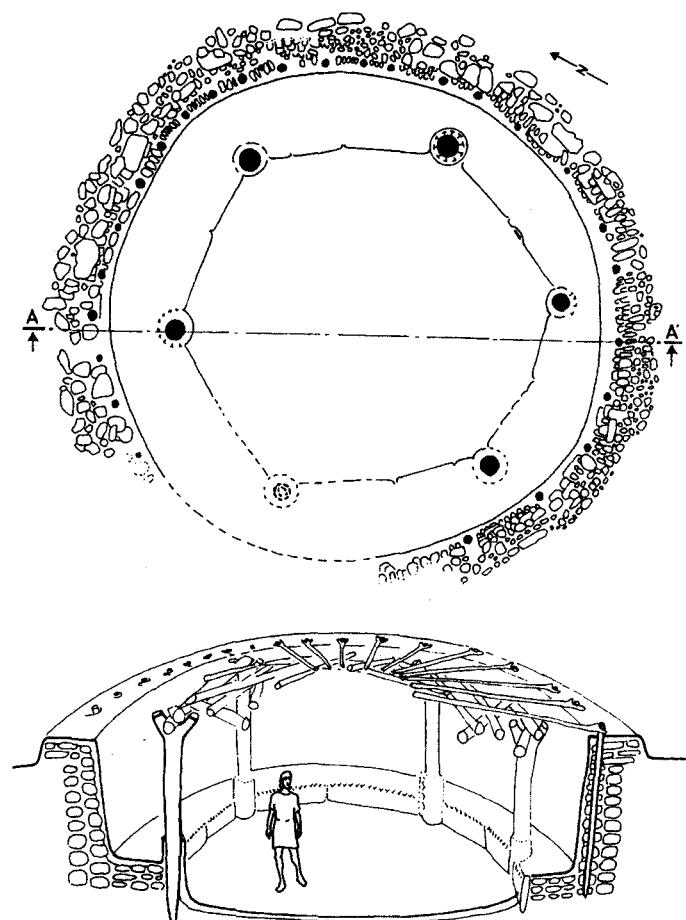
Plan and reconstruction of building EA53 at Jerf al-Ahmar.
